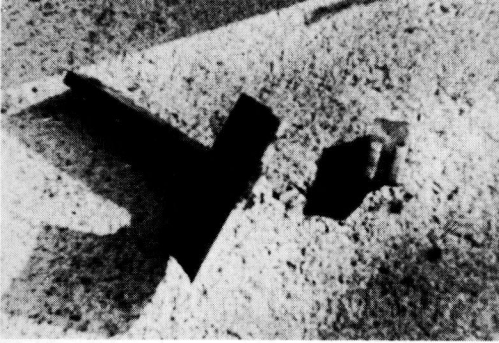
The small cutter is $2\frac{1}{2}$ in. wide and was used for cleaning, roughening, and refacing longitudinal joints. The wide cutter was used for the removal of old, extruded joint-filling materials from the pavement surface adjacent to the crack or joint.
